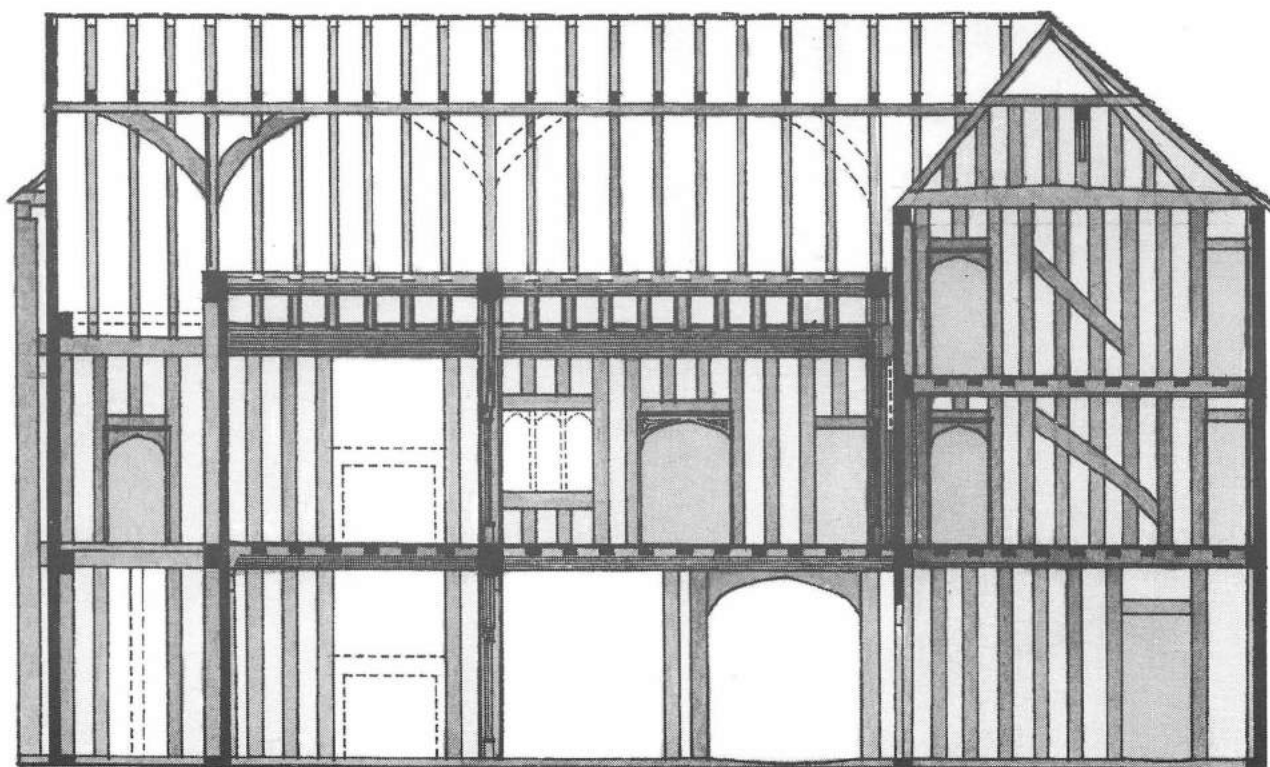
The Red Lion, Colchester. Section through halls and the east wing, from west (left) to east (right). For position of this section refer to Fig. 3.
